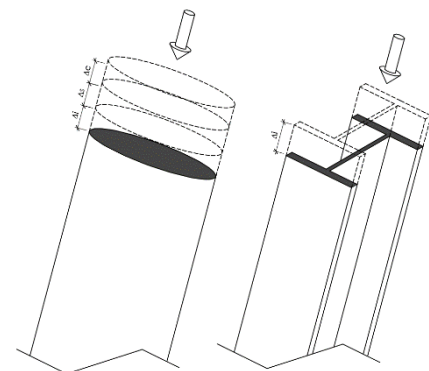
Axial Shortening Illustration for Concrete and Steel
